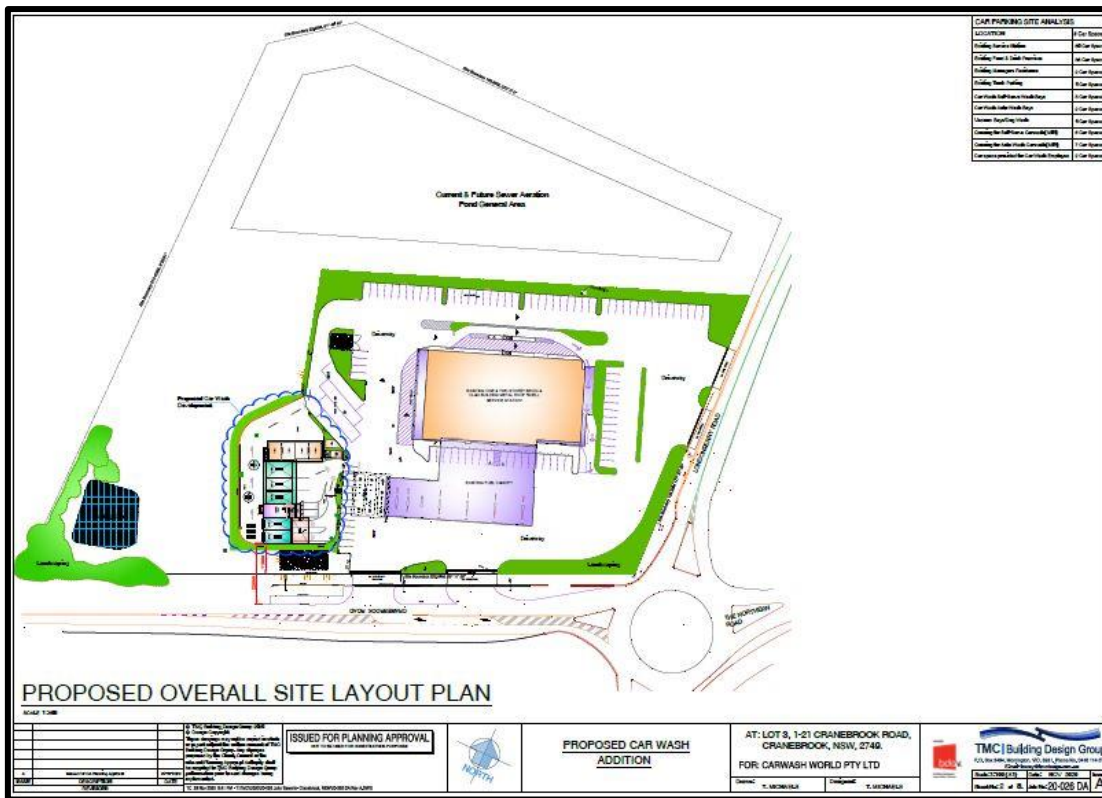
Proposed Car Wash Location (Plan used courtesy of TMC Building Design Group)
